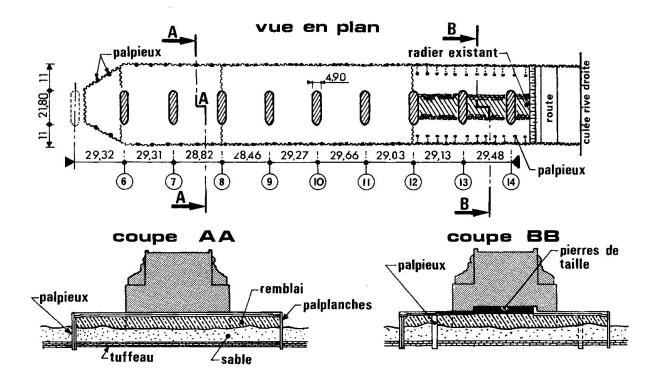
Drawing of the general cofferdam ensuring final strengthening of foundations.
